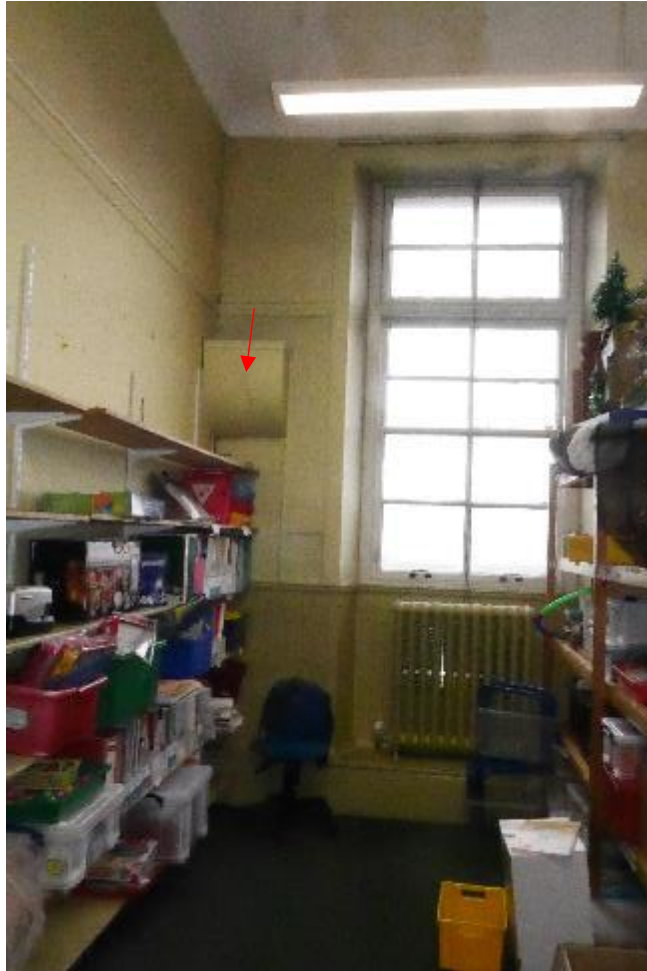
Internal West facing elevation of Classroom (25). Part of ventilation system visible on wall face at red arrow.
